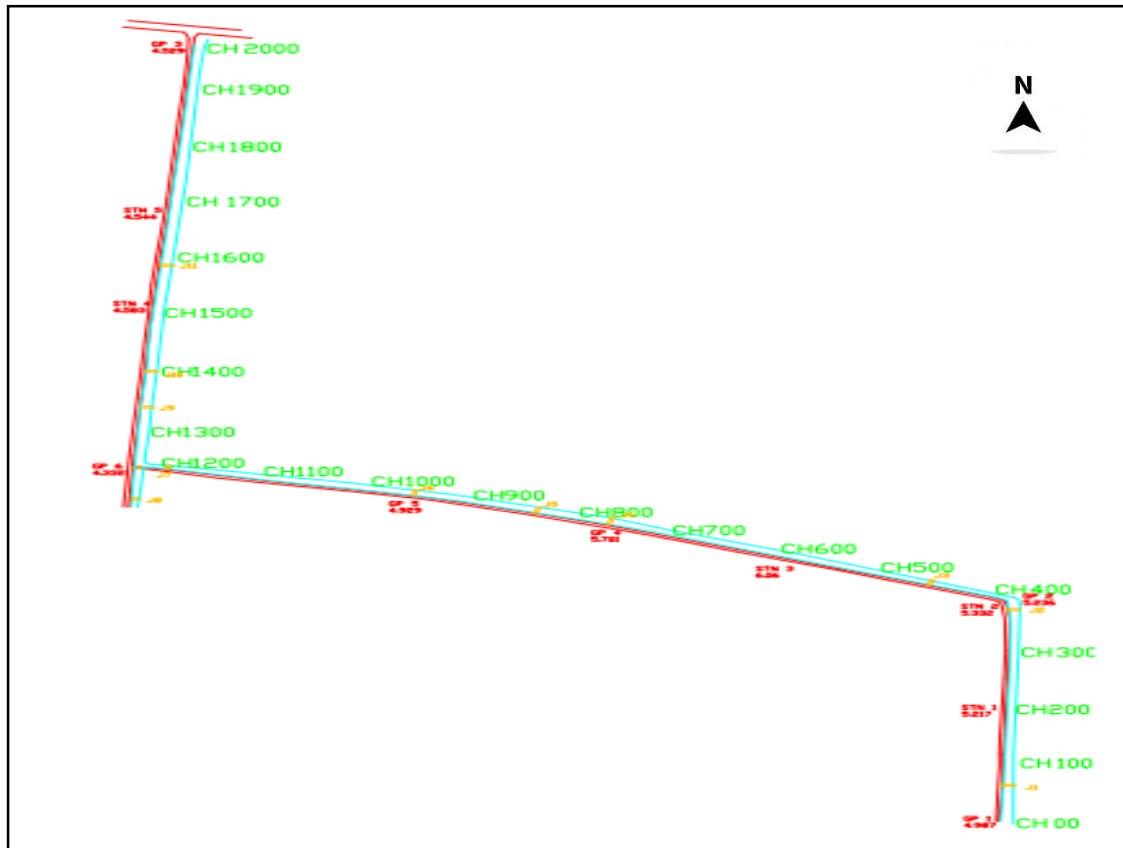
Plan of existing drainage at Parit Keling and Parit Pateri
